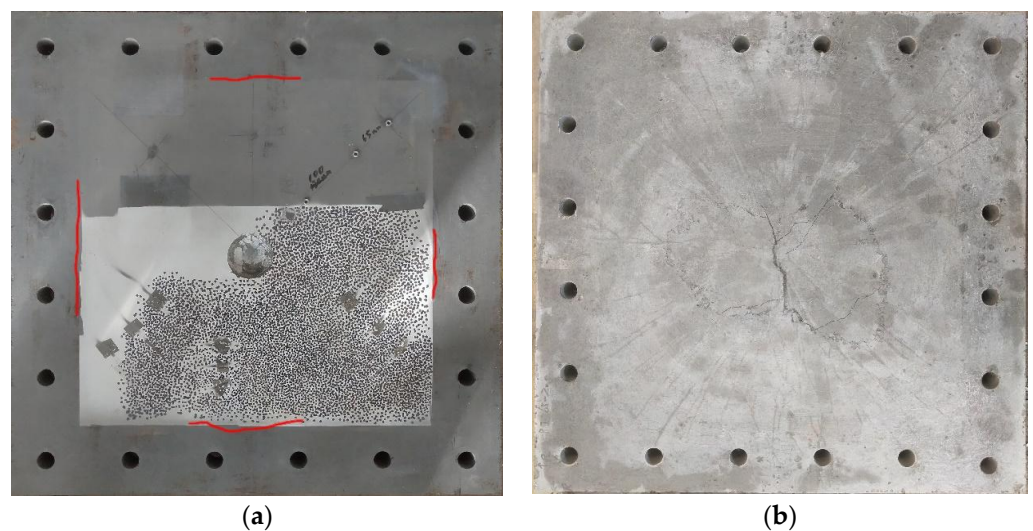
Damages to the plate following the 10th drop: (a) top surface of the plate; (b) bottom surface of the plate. Red lines indicate cracks.
